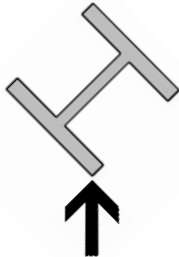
Schematic representation of non-symmetrical vertical load on H section.
